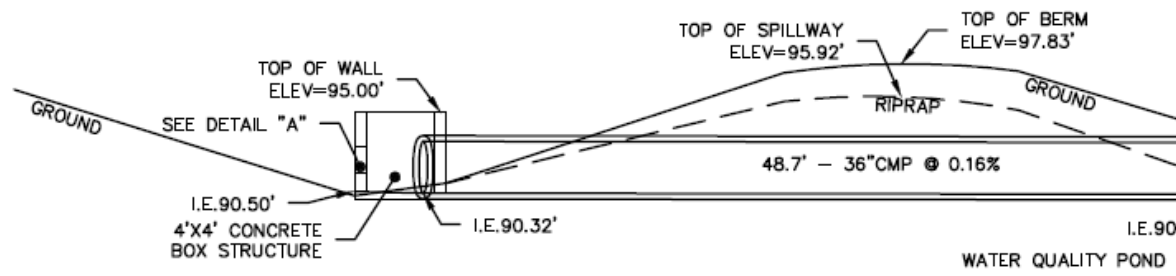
OUTLET STRUCTURE DETAIL
